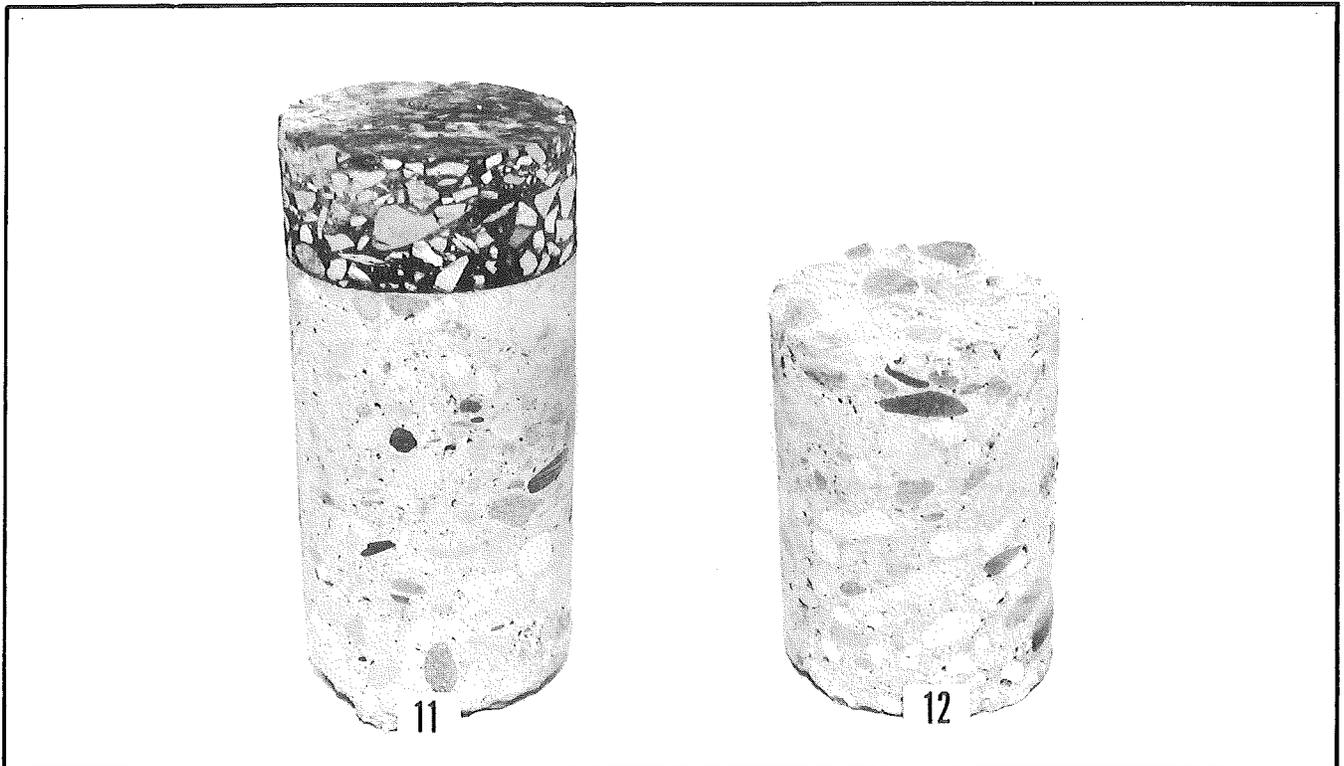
Cores from resurfaced 1942 plain concrete pavement; concrete is nominal 9-in. thickness and overlay is 2-1/2 in. Note good condition of concrete of Core 11 under sound bituminous cap, in contrast to Core 12 where concrete upper surface is disintegrated under alligator cracked bituminous which allowed deicing salts to soak through.
